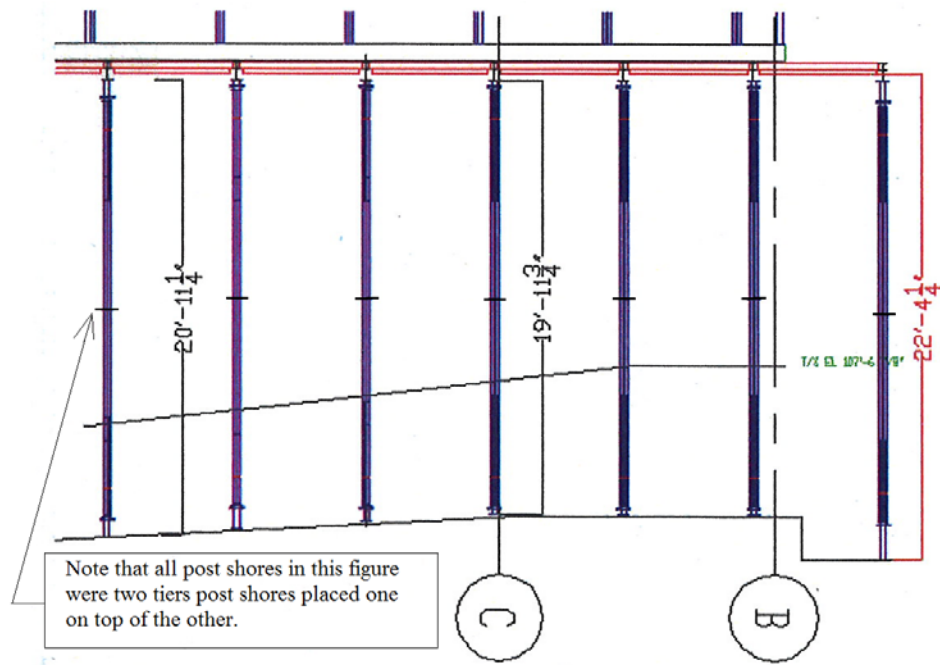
Elevation of the collapsed area as installed (Modified from Ischebeck, 2012).
